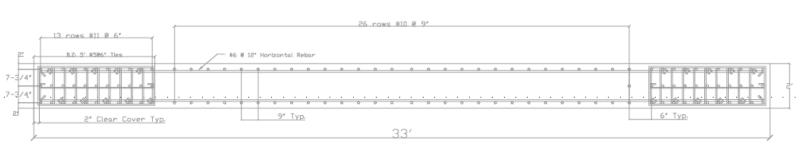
Section of Wall Detail at 1st Floor Level including Vertical, Horizontal, Boundary Zone and Tie Reinforcement
